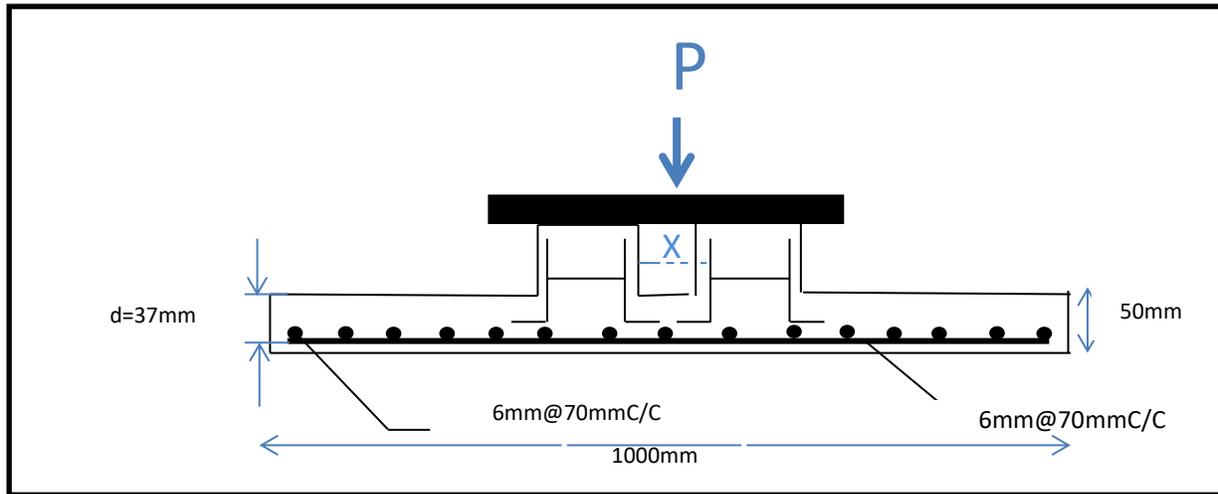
Details of specimens Cross-section and Load Arrangement to two columns.
